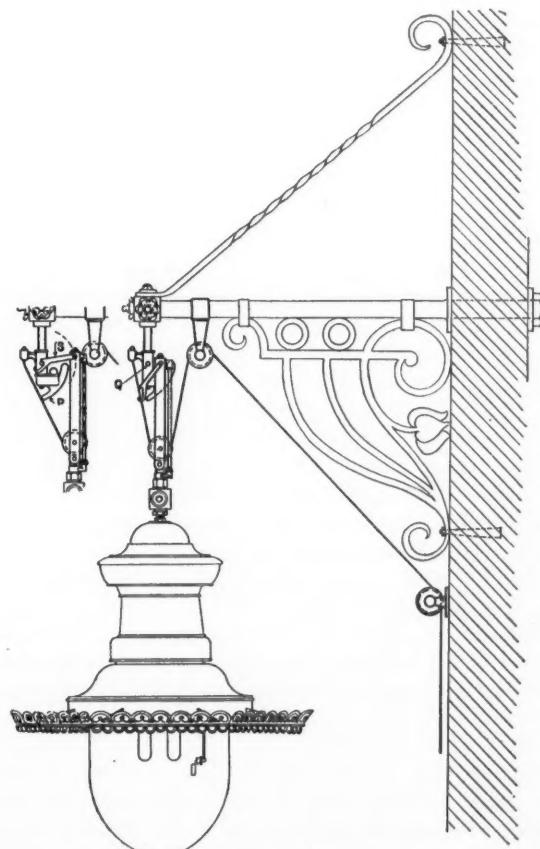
High-pressure Gas Lamp on wall bracket, fitted with Raising and Lowering Gear.
